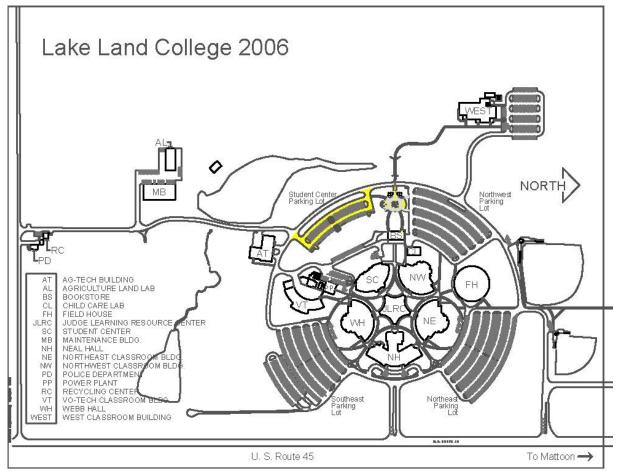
Campus Development – Alumni Park and Student Center Parking Lot
